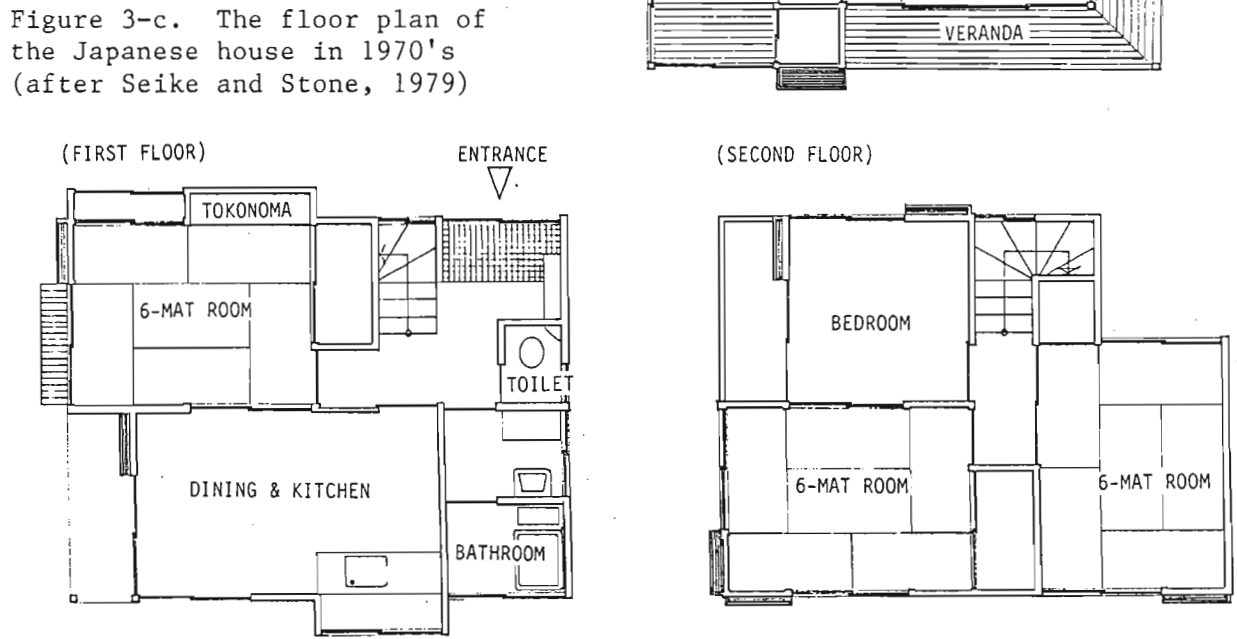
c. The floor plan of the Japanese house in 1970's (after Seike and Stone, 1979)
